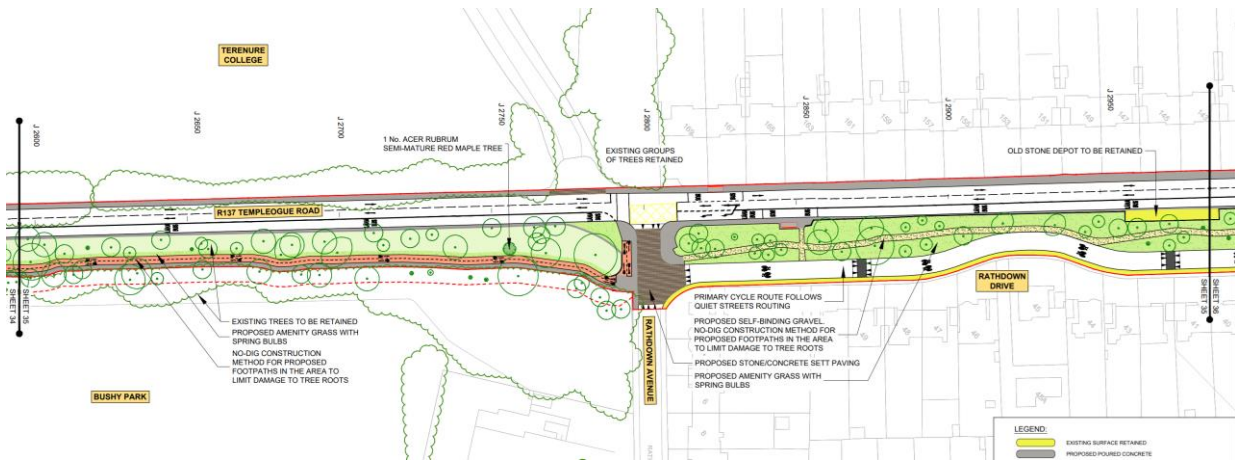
Extract from Landscape General Arrangement Plan Sheet 35 of 37
